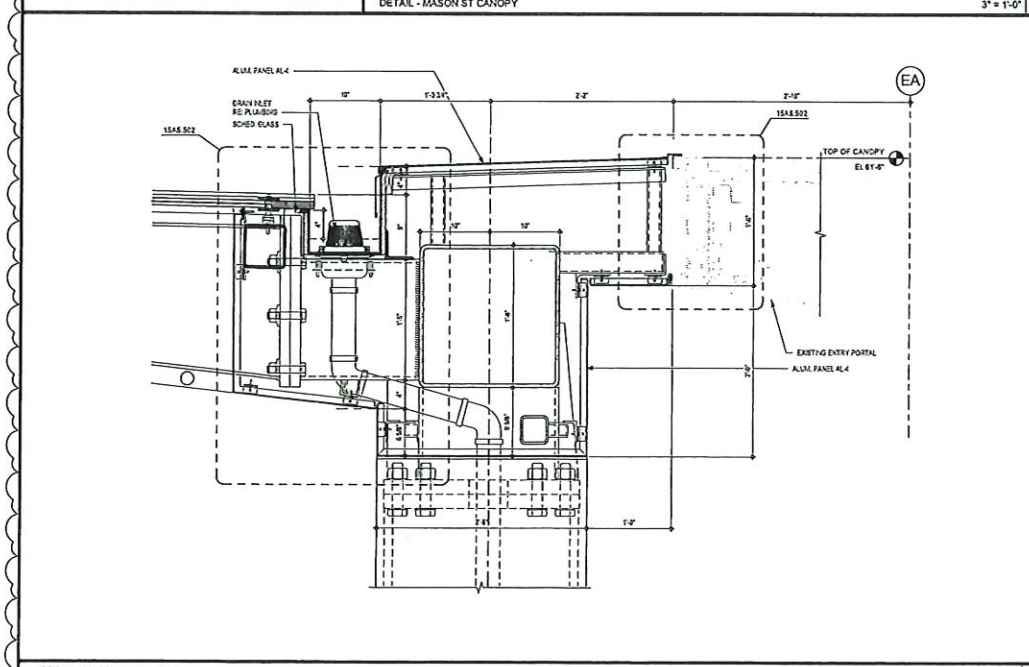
DETAIL - MASON ST CANOPY 3" = 1'-0" 28
